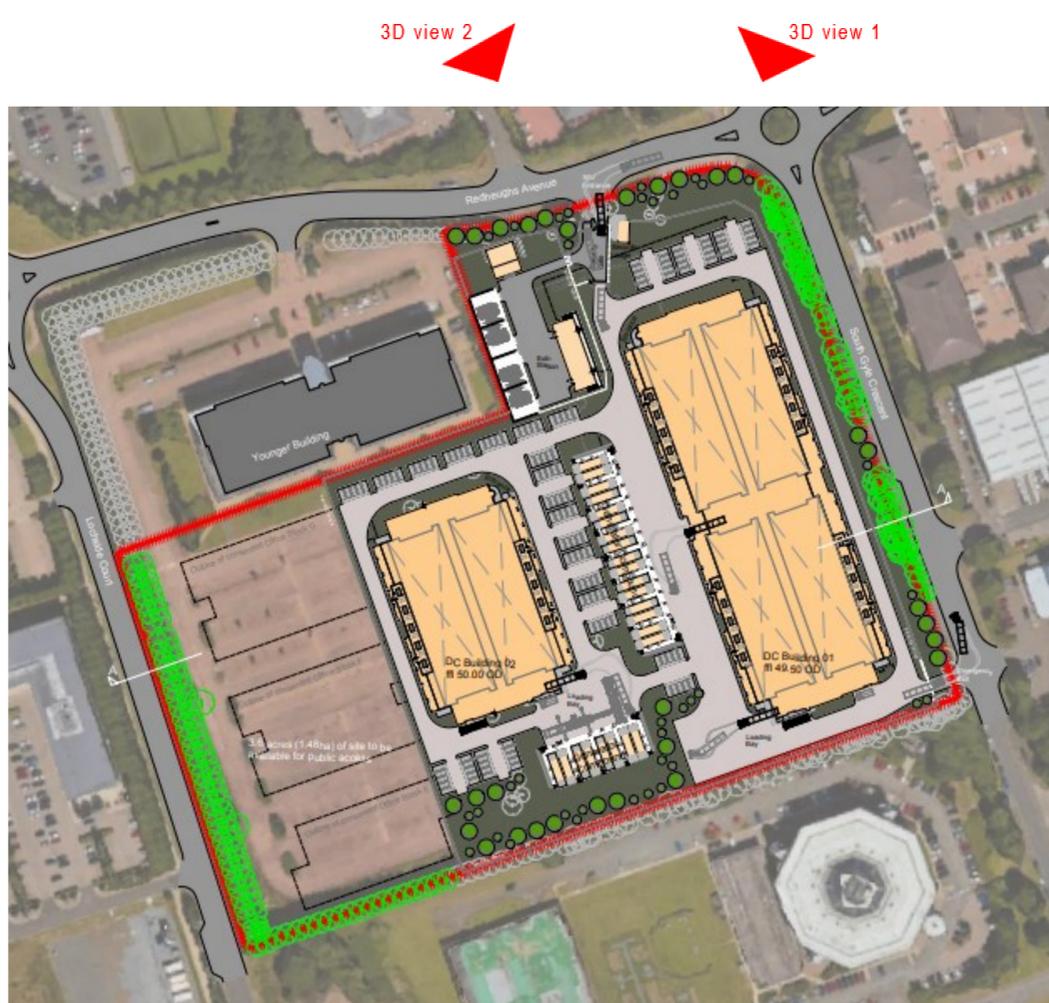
Proposed illustrative Layout Plan : Source: studioNWA Architects
